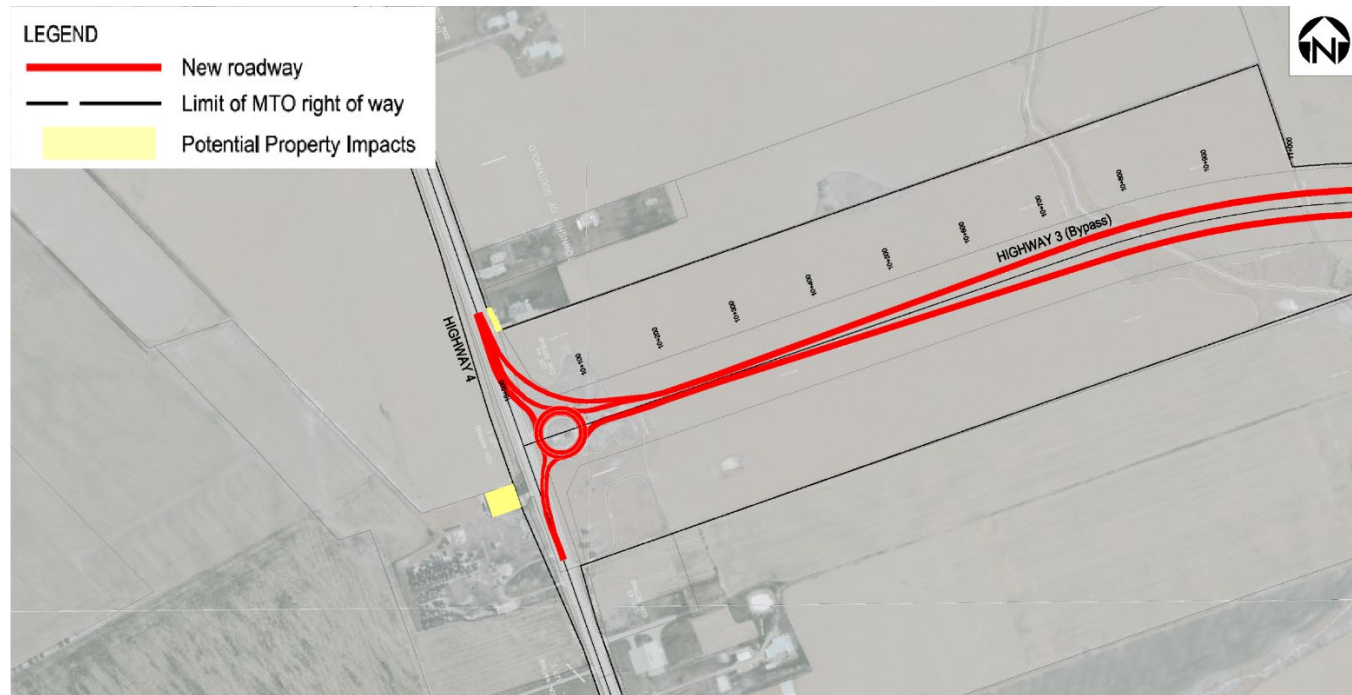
Highway 4 Intersection Alternative 2: Roundabout Offset East of Highway 4 (With East to North Bypass Lane)
